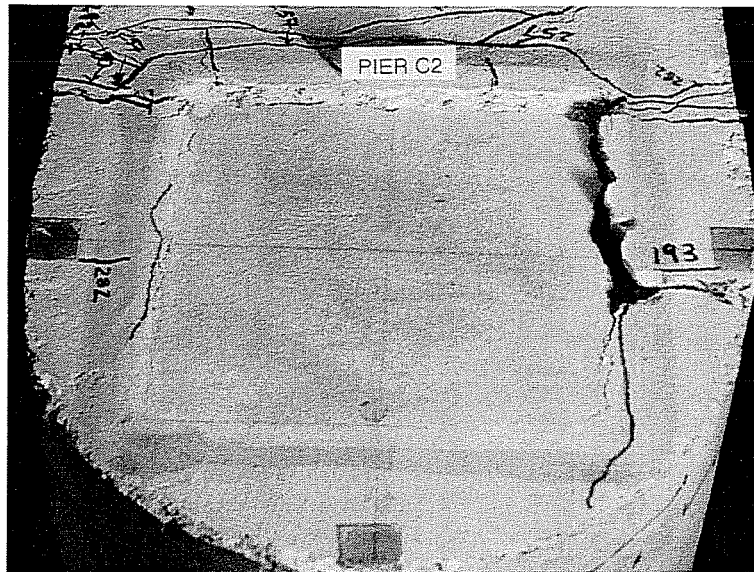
Cracking and Punching Under the Base Plate for Pier C-2
